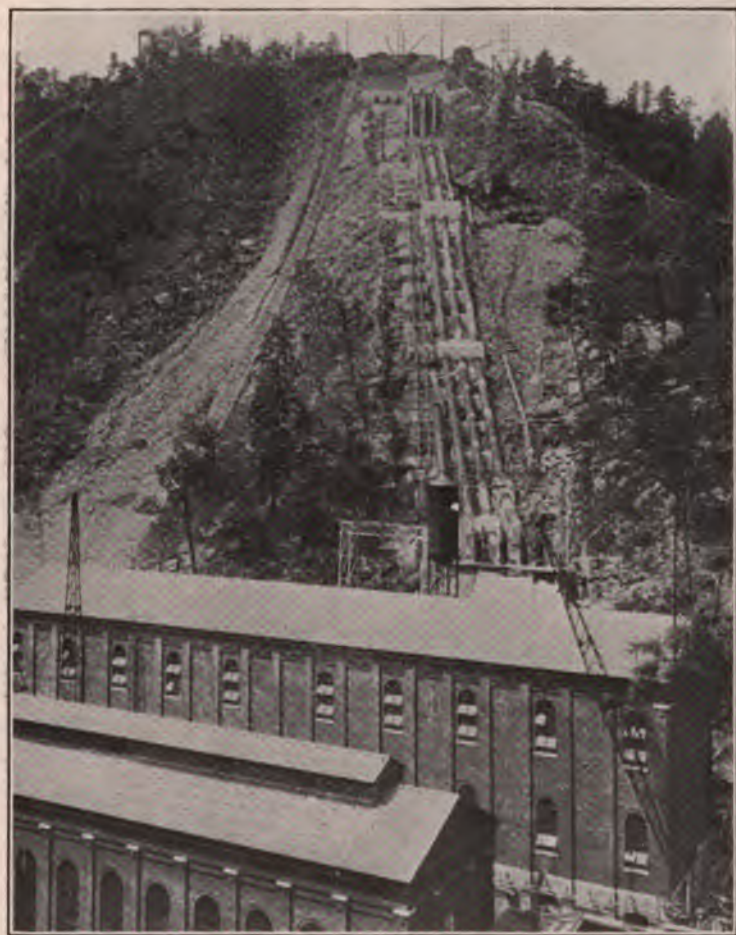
Penstocks during construction, power house and switch house in foreground, inclined railway to the left.
